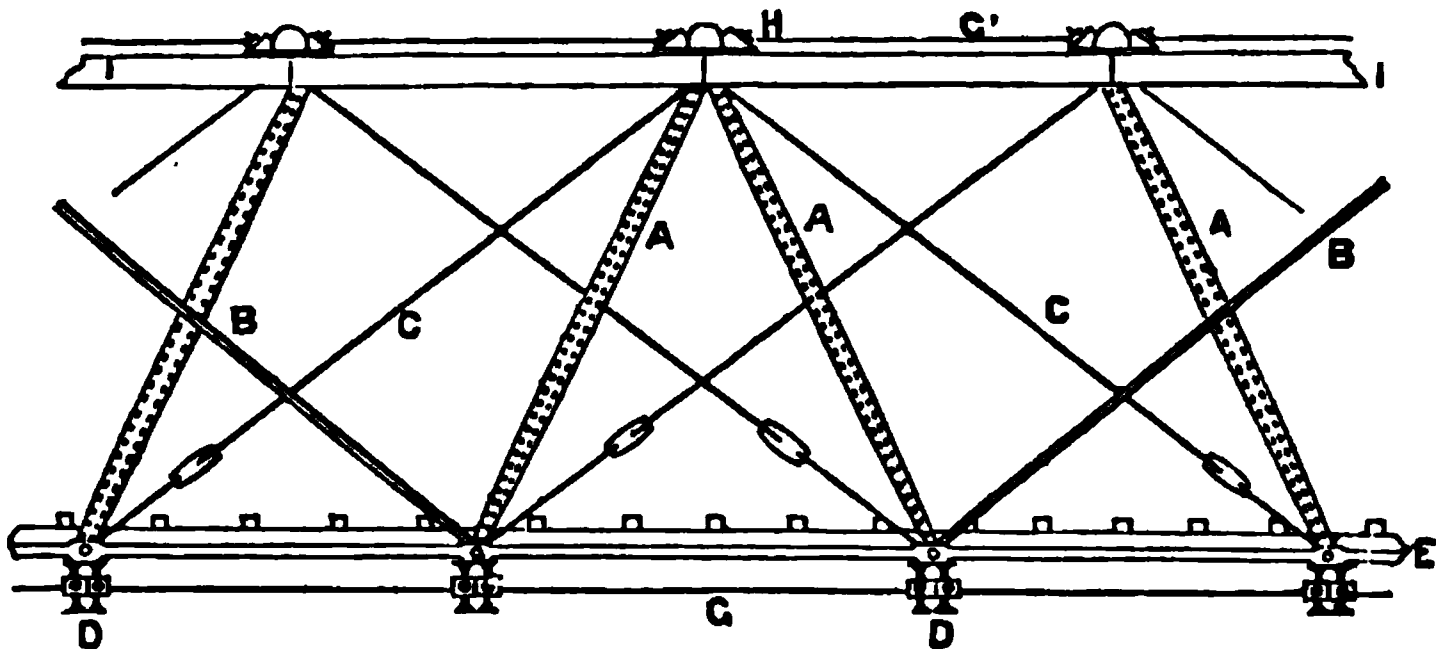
Side view of panels of a Post Truss. A A are struts. B B, main ties. C C, counter ties. E E, bottom chords. I I, top chords. D, ends of floor-beams. G, lower horizontal diagonal ties. G', upper horizontal diagonal ties.
